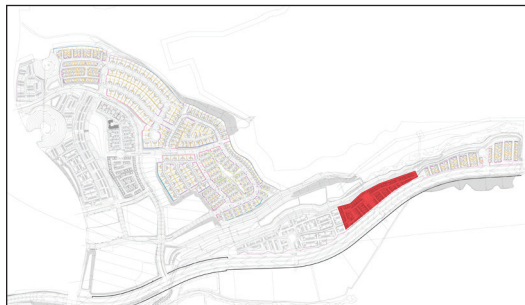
PA-18 WALL & FENCE DIAGRAM
